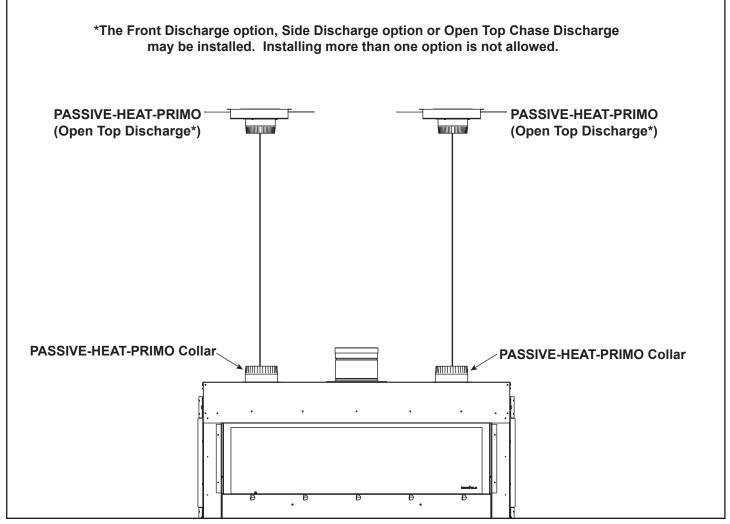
PRIMO Passive Heat Open Top Discharge Configuration / Remove PRIMO Passive Heat Seal Plates
